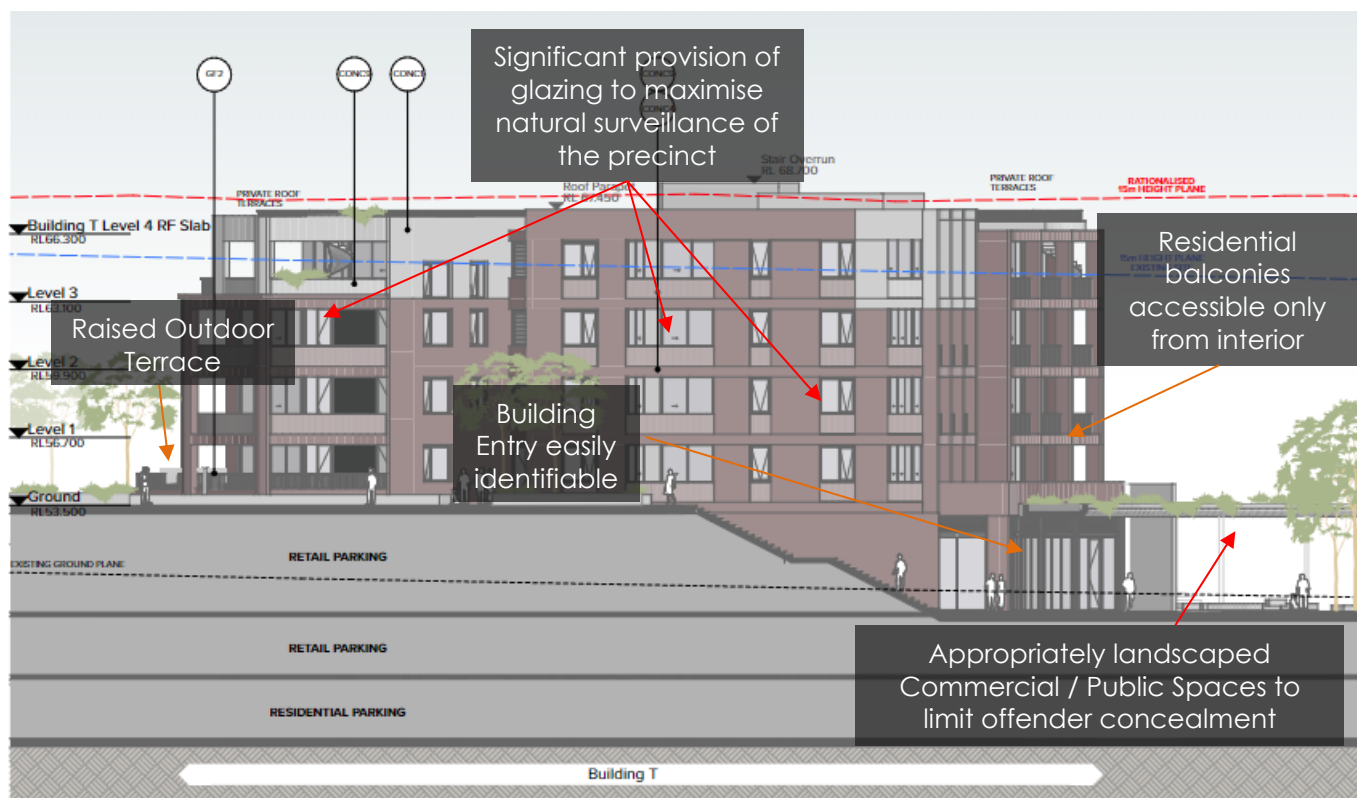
Extract from Building T Northwest Elevation (Source: Turner, 2024)
